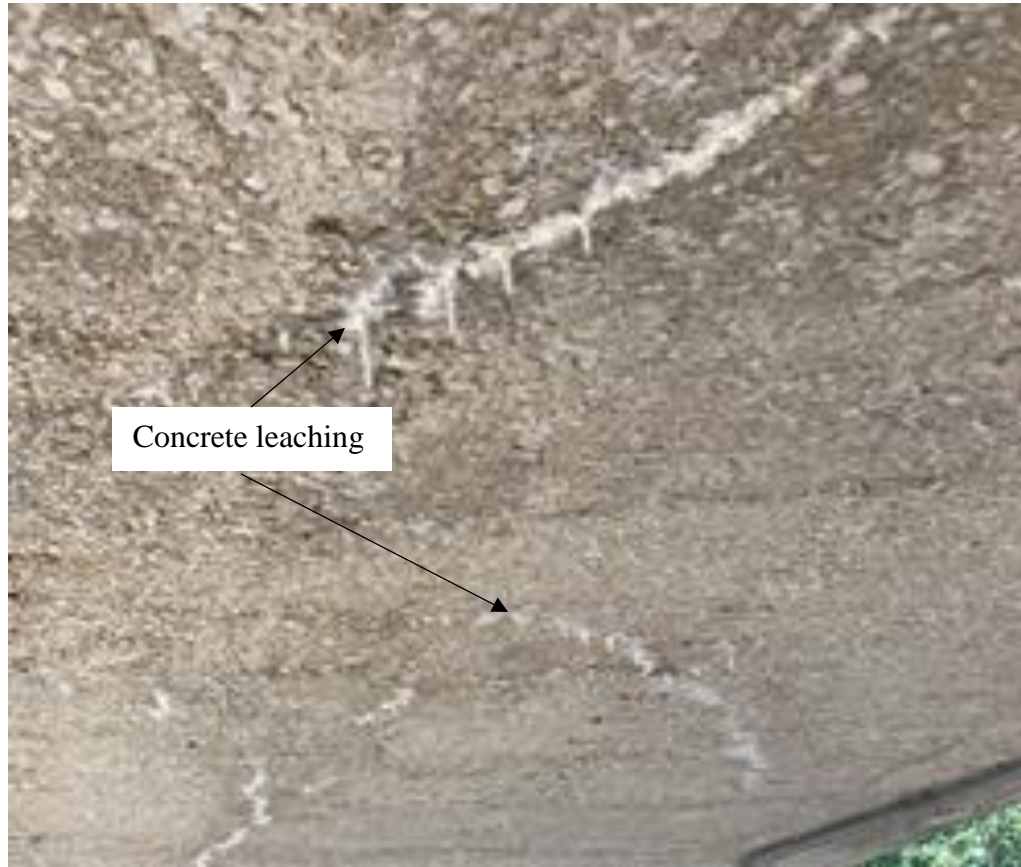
Bridge deck deterioration shows concrete leaching.
